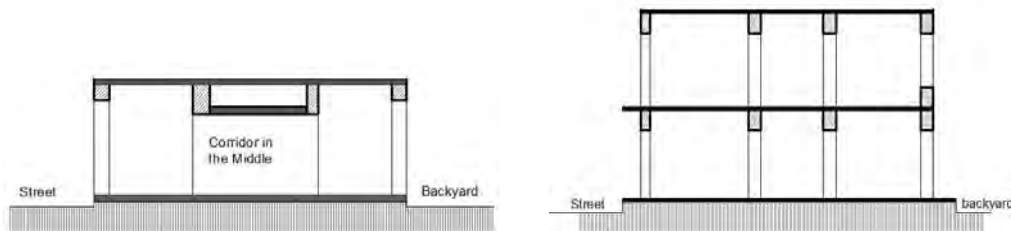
Conceptual Section of Consolidated Type Buildings
